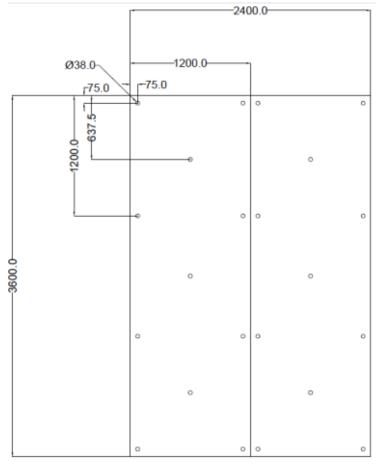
Fixing arrangement of the ceiling lining (from above) in the tested system described in RTF200088 R1.0
